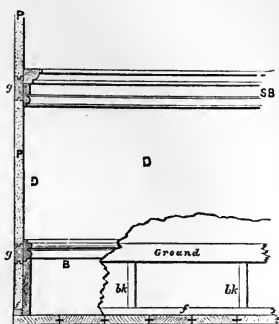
Scale, $\frac{1}{2}$ inch = 1 foot.
